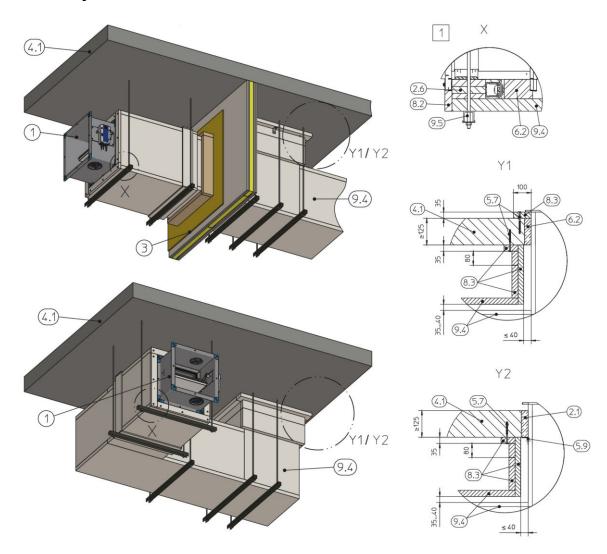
Dry mortarless installation remote from solid ceiling slabs
